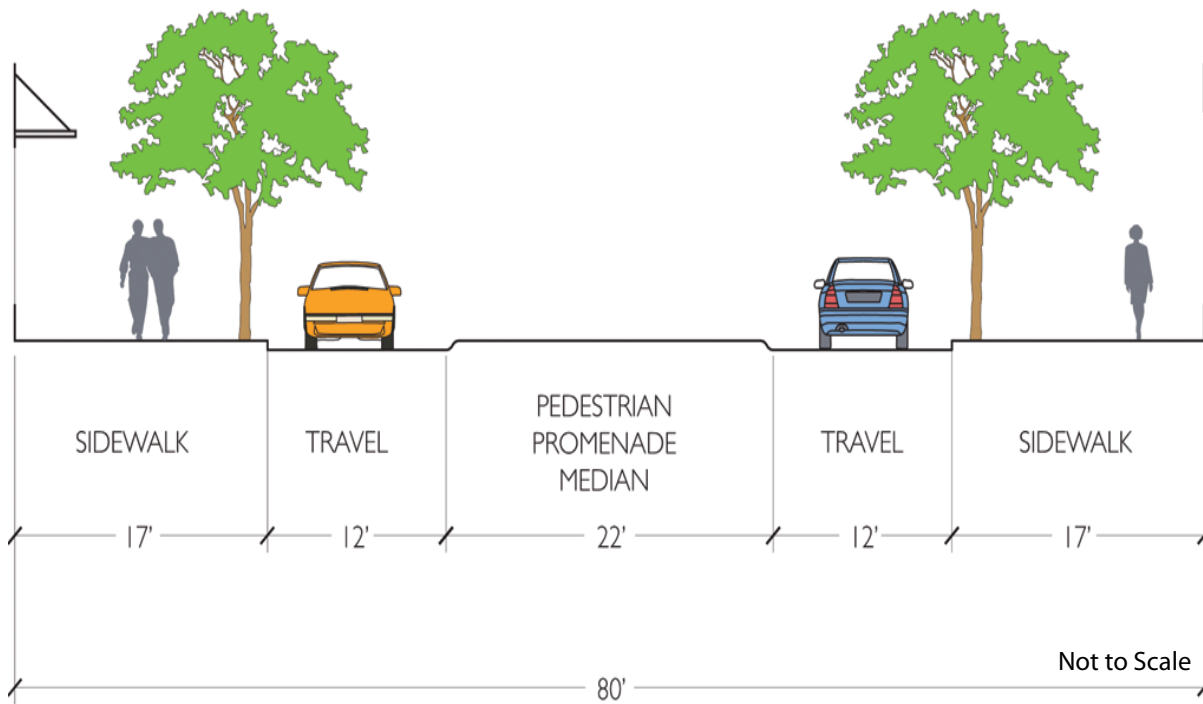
Conceptual Design - West Broadway Avenue Cross Section-Median with Pedestrian Paseo
